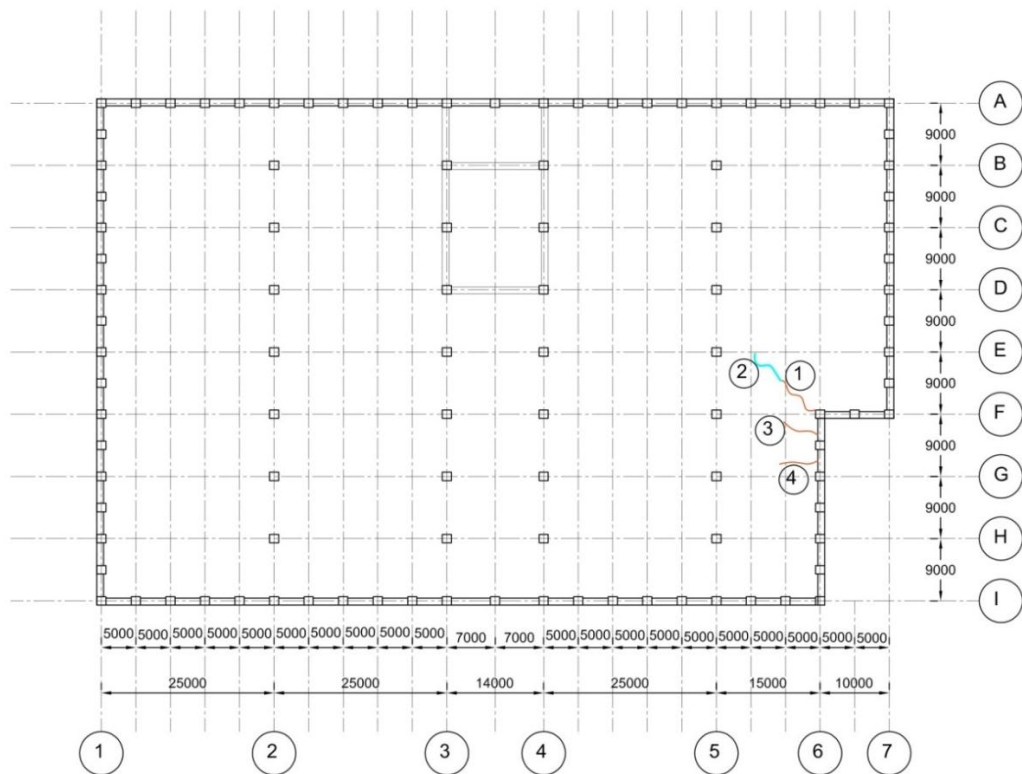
Location of Cracks in Floor Plan of Project-A
